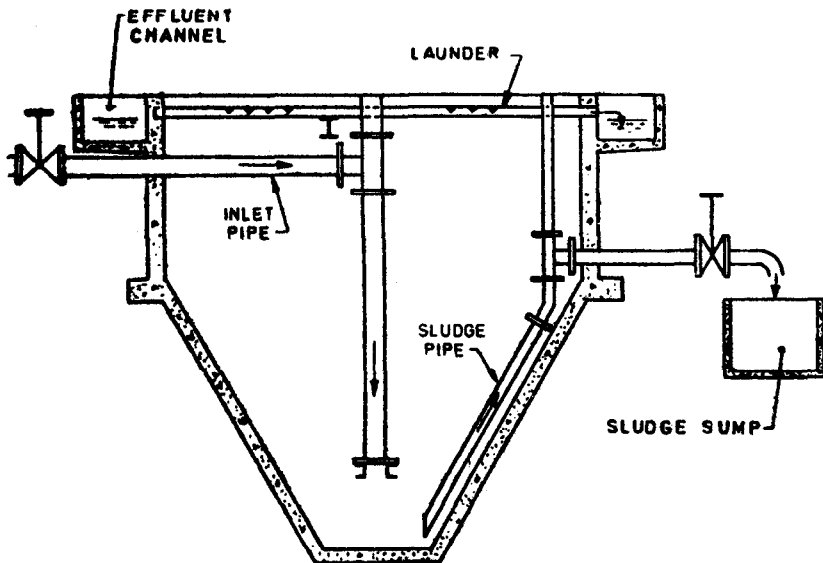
TYPICAL SKETCH OF HOPPER BOTTOM SETTLING TANK
